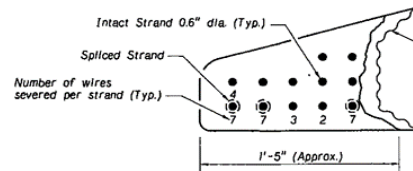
Severe II damage, five severed strands and vertical downward deflection, camber of +1 in. at undamaged girders and -0.48 in. at Girder (E), NDOT Wood River Interchange Bridge Girder (E)
